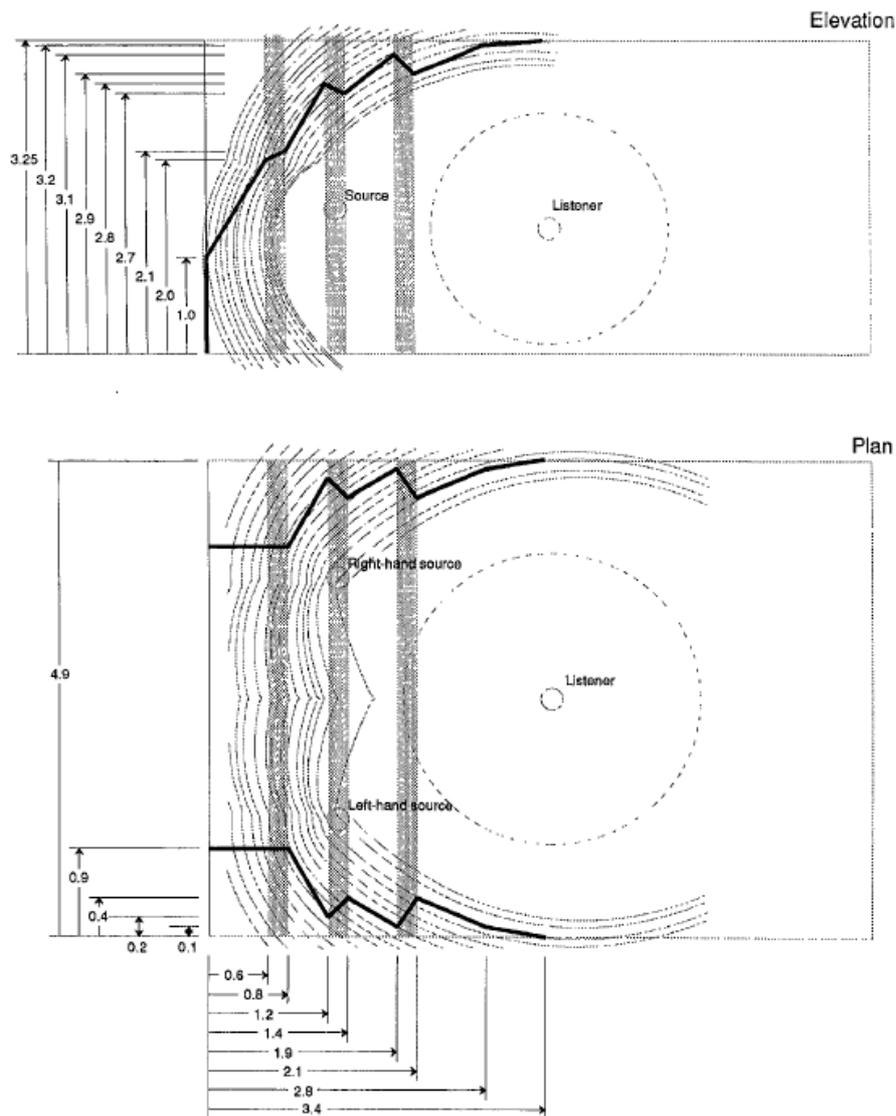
Design sketch for the completed test room at the BBC R&D Department [9]
